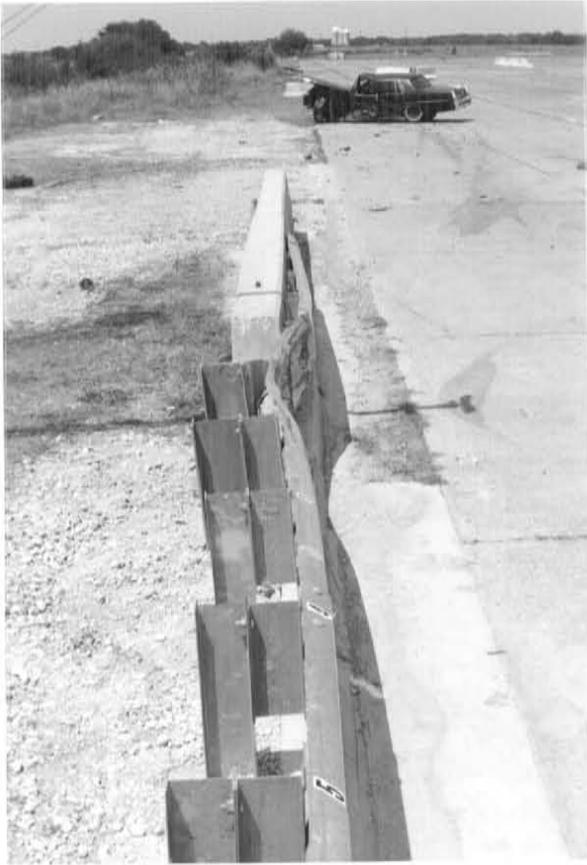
Arizona guardrail transition to concrete half barrier after test 7155-5. (continued)
